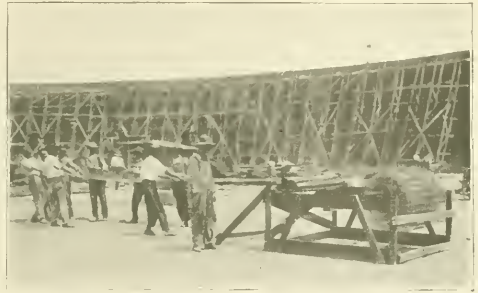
Wire Fabric used for reinforcing on walls showing how it was straightened
